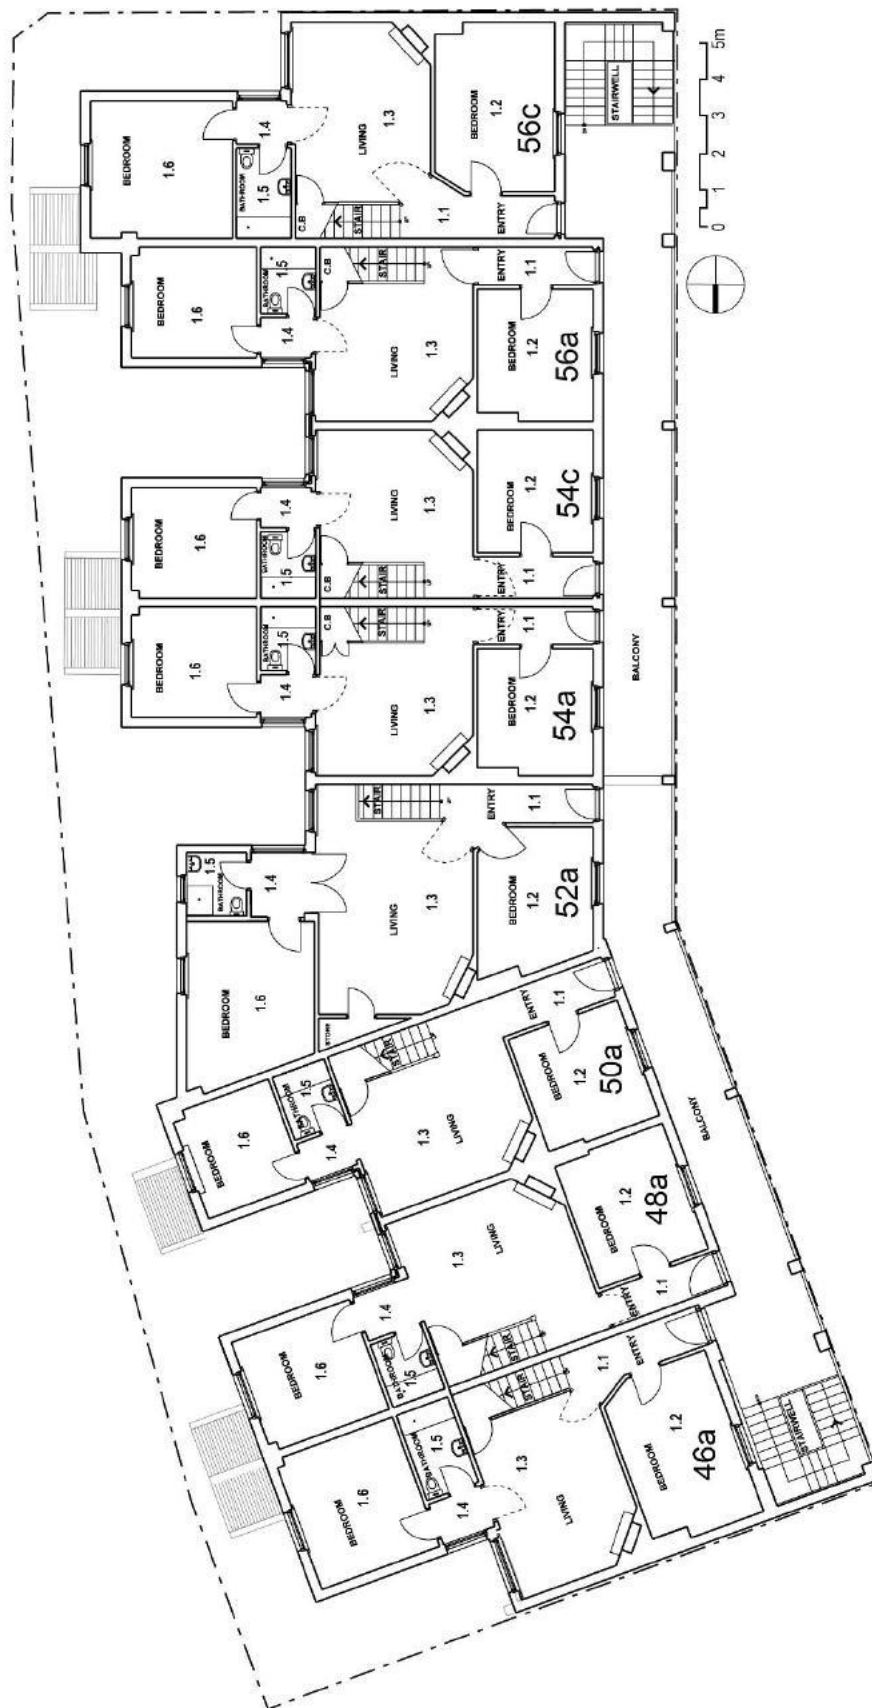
First floor level plan. (Source: SHFA, amended by GML, 2016)
